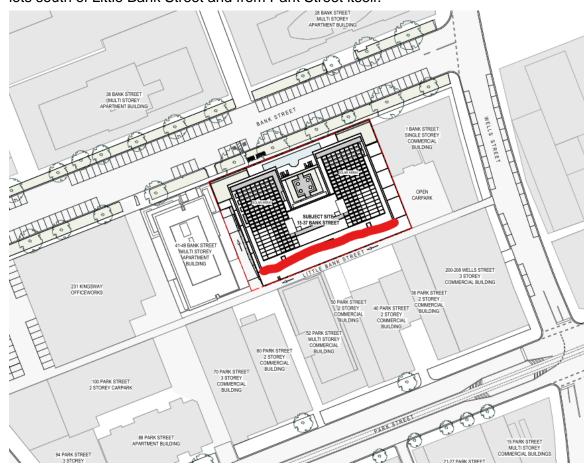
Proposed site plan showing the proposed 57.3m wide tower at the rear to Little Bank street.
